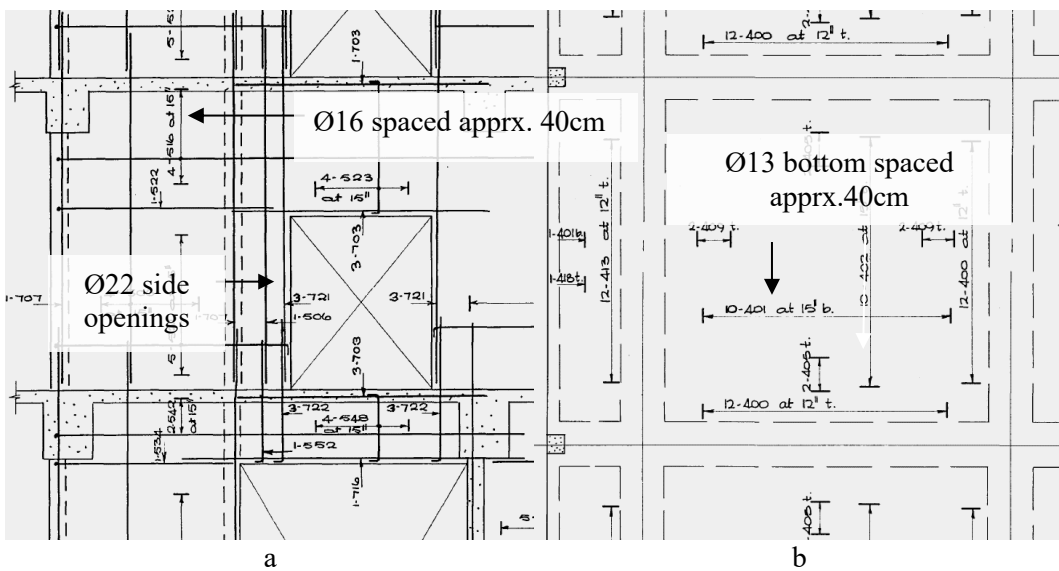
Shear wall (a) and Sabs (b) reinforcement details.
